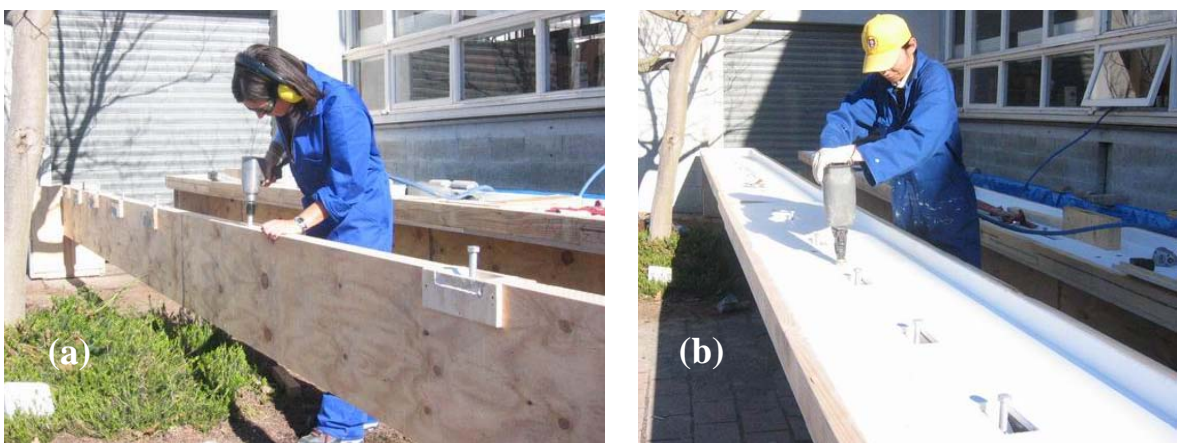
(a) Inserting coach screws using a pneumatic powered socket gun; (b) Attaching flange formwork to the LVL joist with a nail-gun
